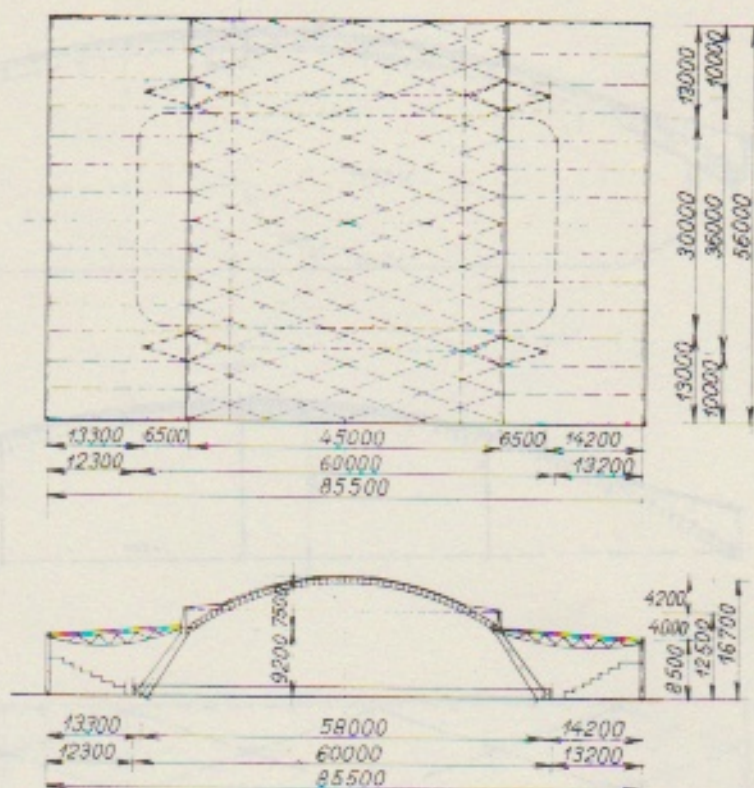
Plan and cross-section of the barrel vault for an ice rink in Havlíčkův Brod.
